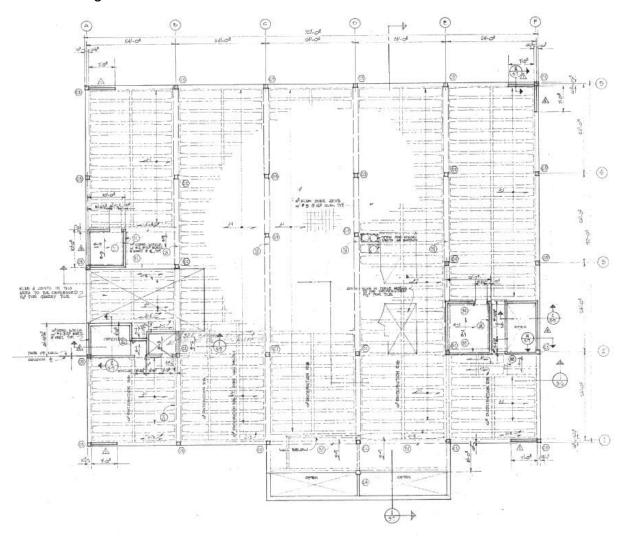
1st Floor Framing Plan, 1965 Structural Drawings
